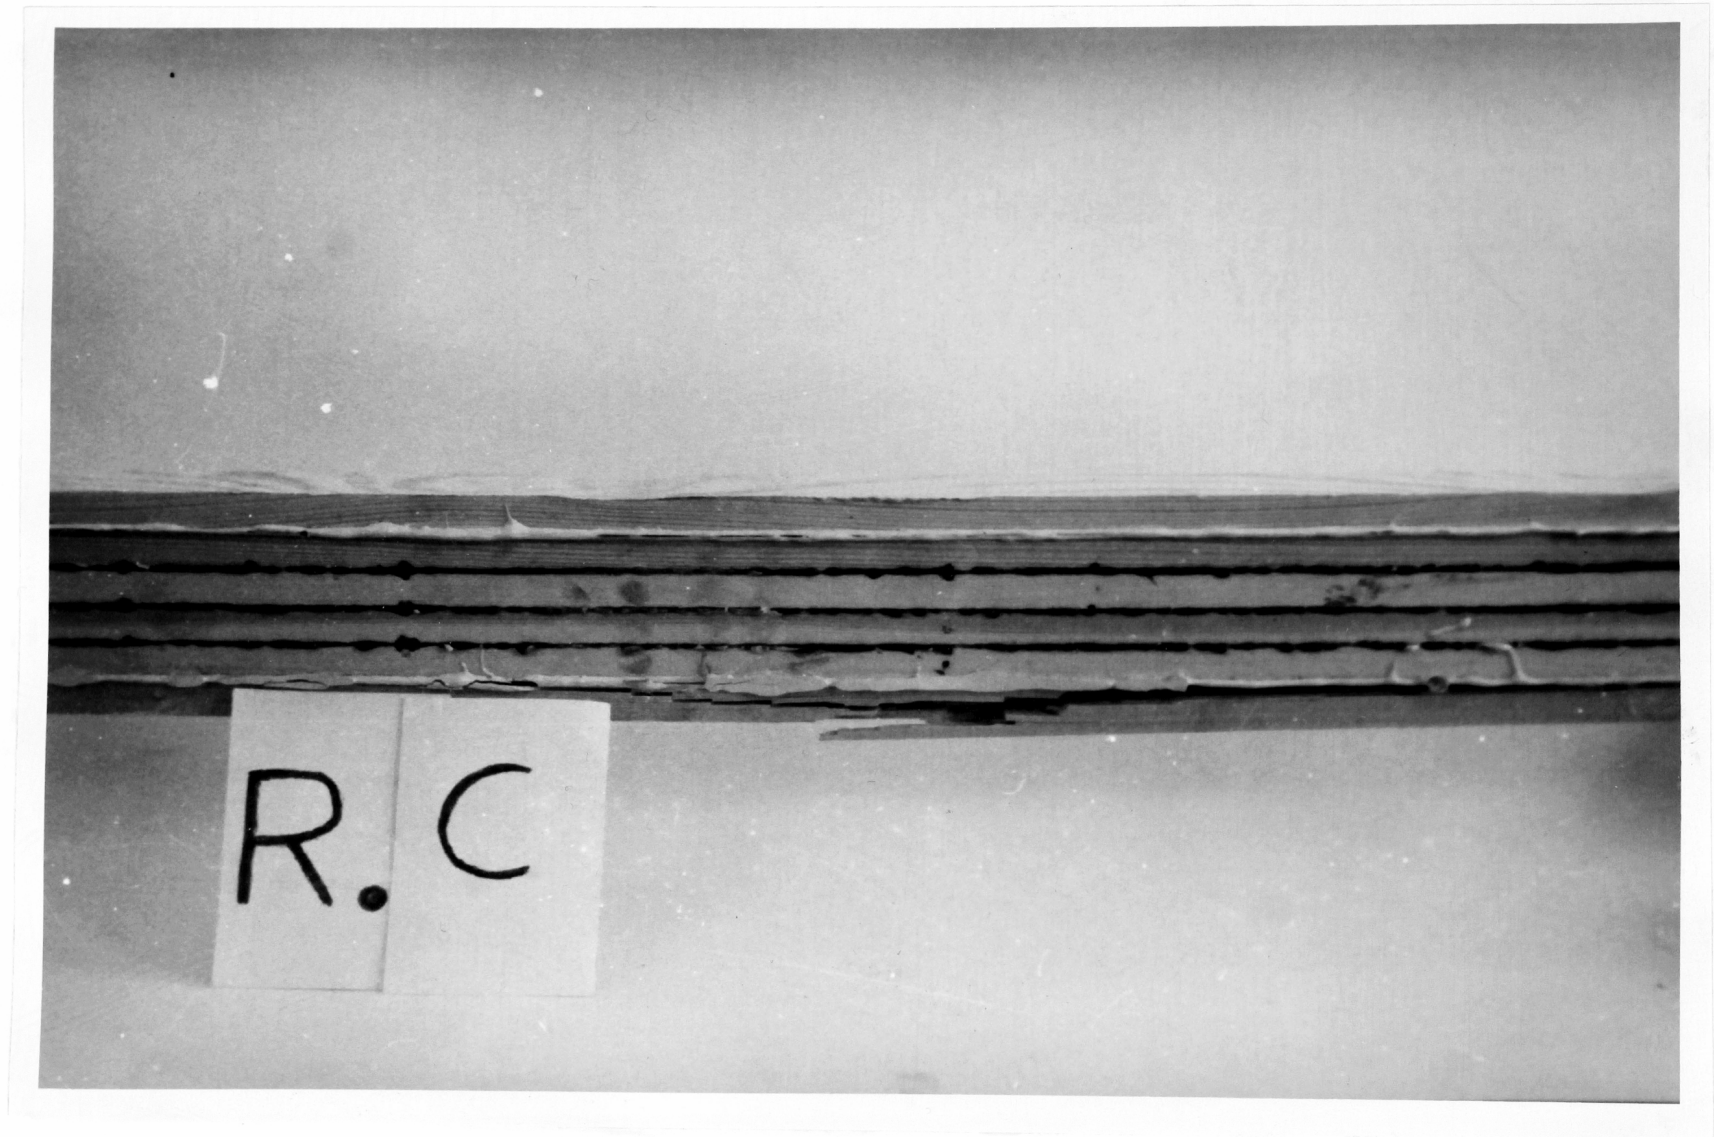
FIGURE V TYPICAL FAILURE OF THE REINFORCED BEAMS, TYPE C
